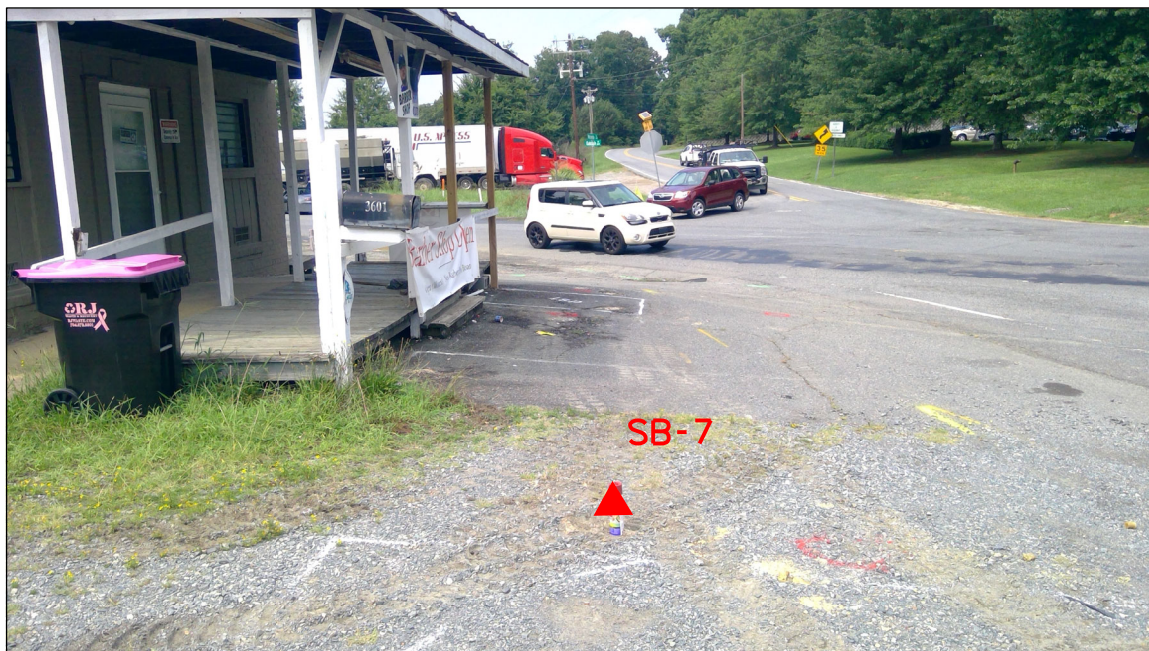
VIEW OF SOIL BORING LOOKING NORTHWEST
